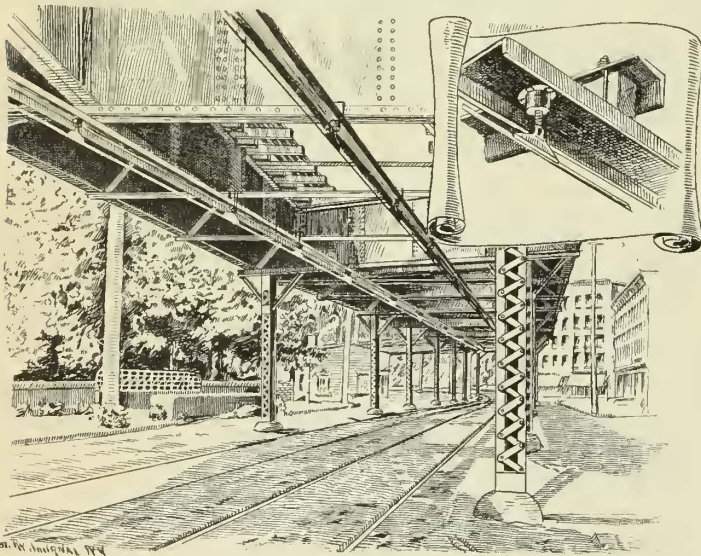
METHOD OF ATTACHING TROLLEY WIRE TO ELEVATED STRUCTURE—UNION RAILWAY CO.
